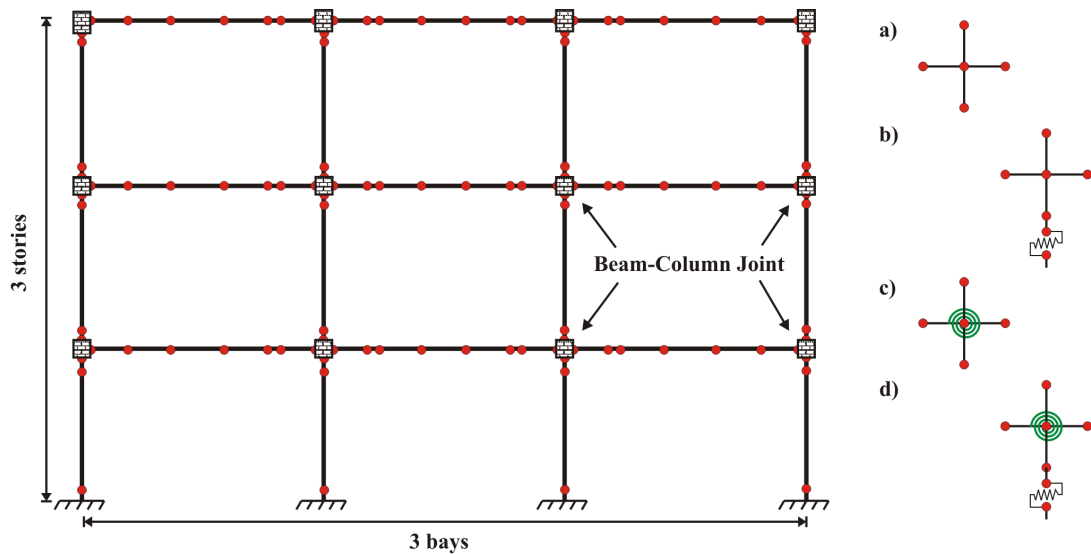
OpenSees full-scale two-dimensional model with four different combinations of the joint and column spring details: a) rigid, b) column, c) joint, d) joint-column. Beam and column section detailing is referenced (Bracci et al. 1992a).
